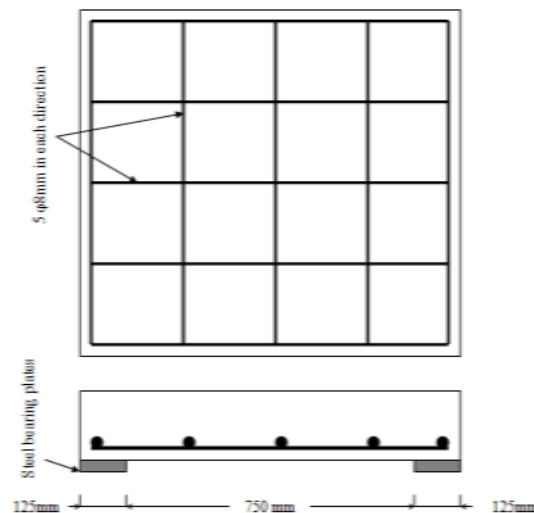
Dimensions and Reinforcement Details of Slab Specimens.
